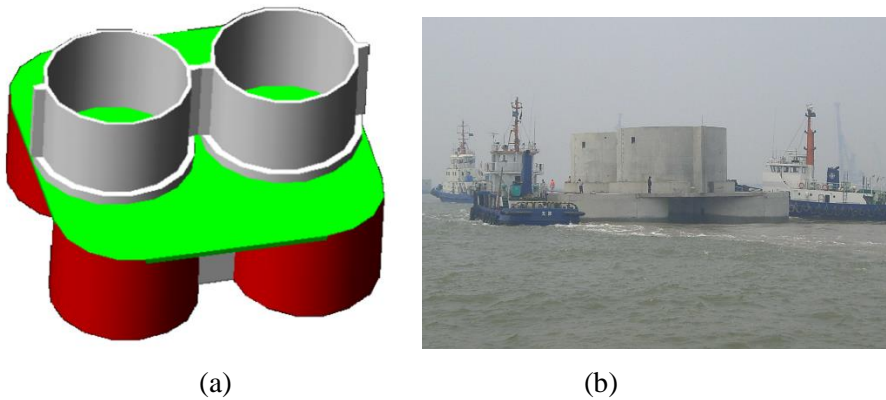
(a) Cylindrical concrete sea walls supported by suction caissons (after Chu et al. 2012c); and (b) Towing of suction caissons and sea wall unit to the installation site
